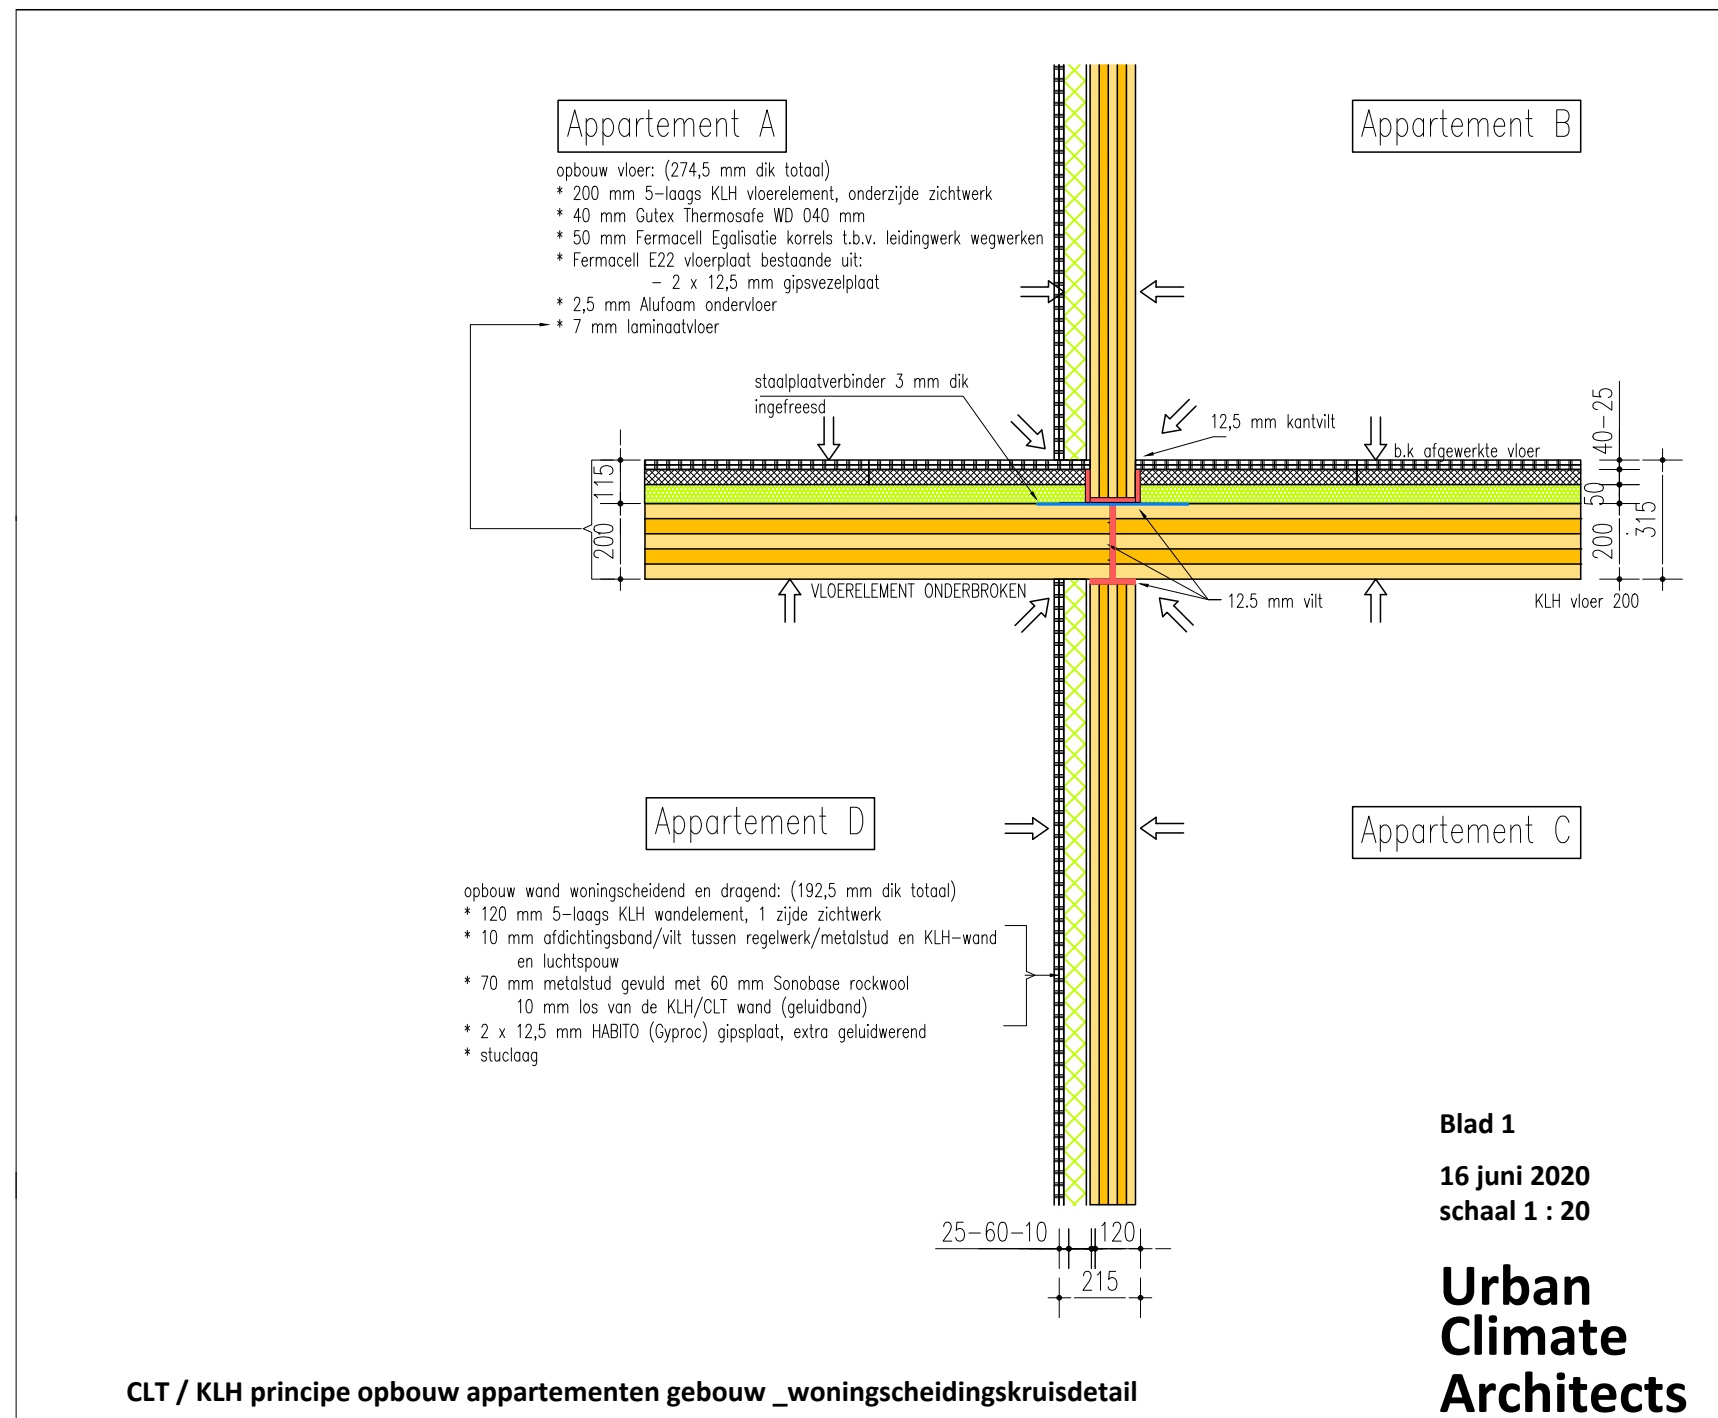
Vertical section for building with high demands, regarding sound insulation. Joint flooring to load-bearing apartment separating wall.
